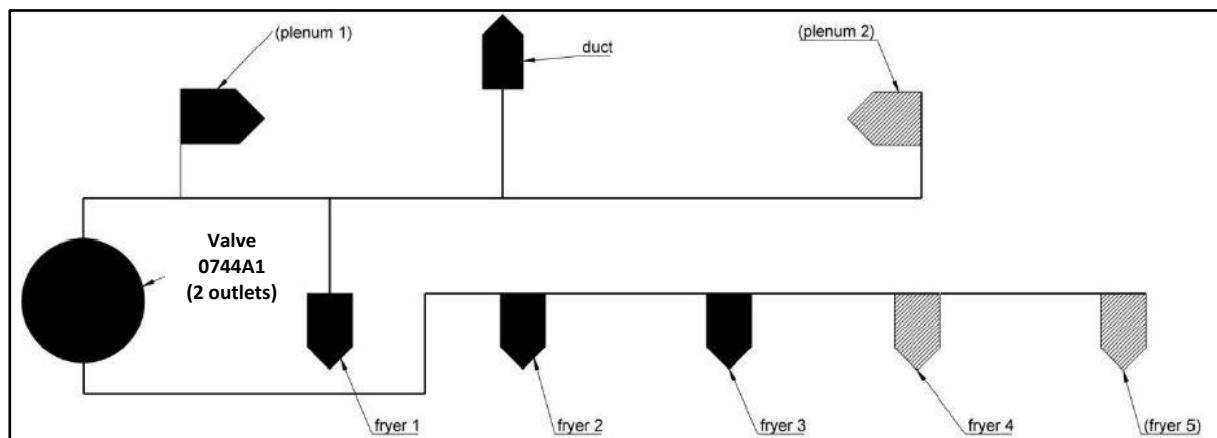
Typical and basic scheme for piping layout of System “Medio”
